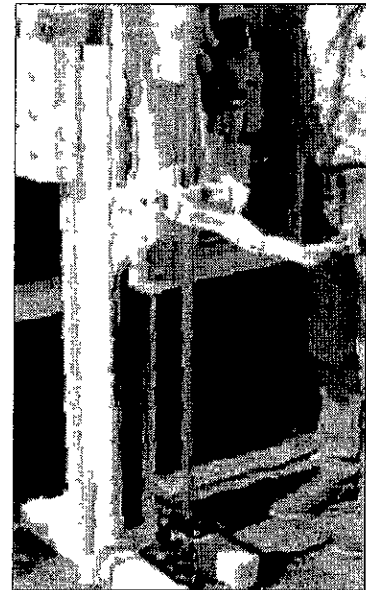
Raise the inner rod string with the Rod Grip Pull System if rods are too heavy to lift by hand.
